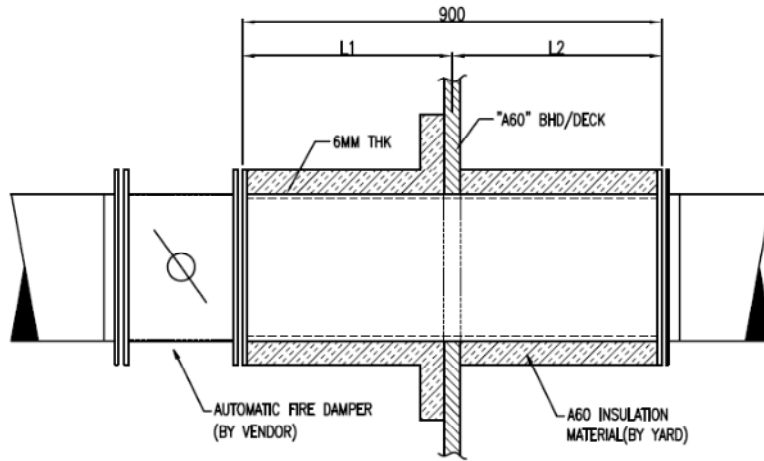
Typical duct flange details for steel ductwork (Fire rated duct)
